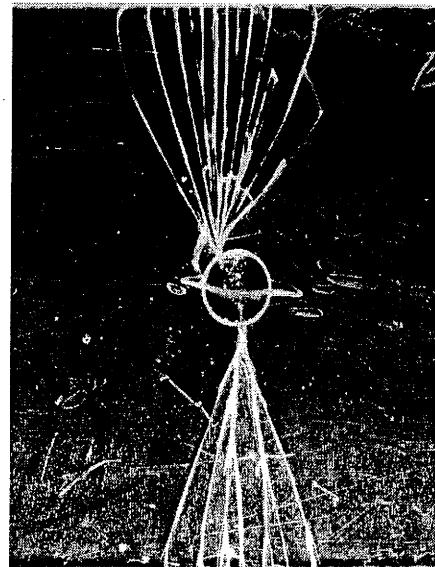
Typical crack pattern of glass panel with hole under horizontal tension
